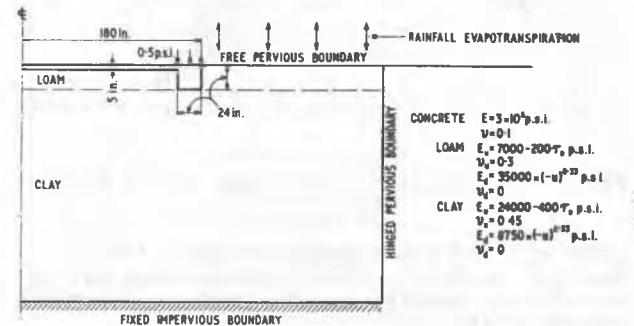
DETAILS OF SLAB-ON-GROUND FOUNDATION.
